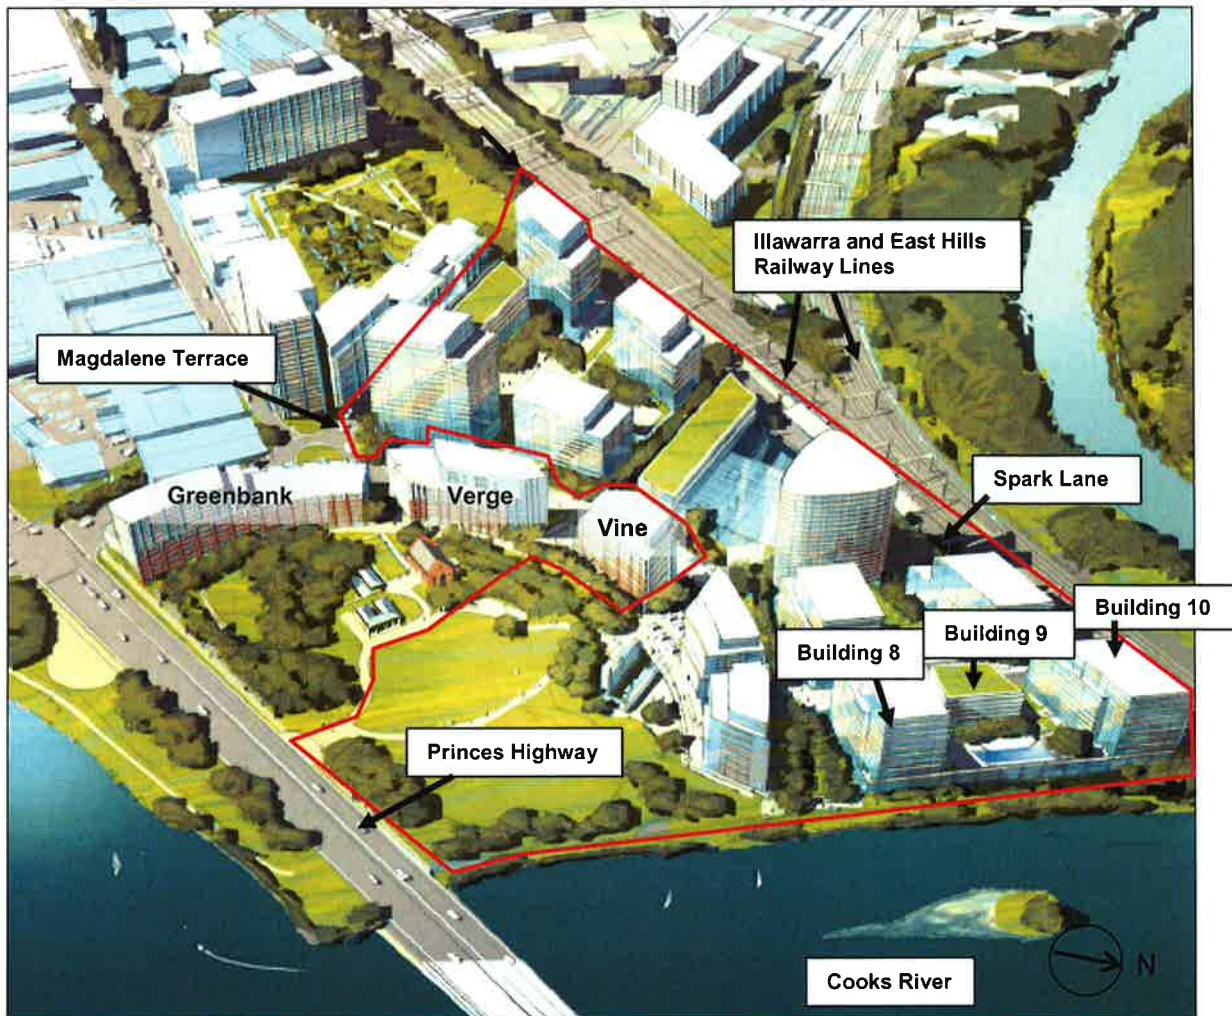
Location and approved concept plan layout, (concept plan boundary in red) of Discovery Point site
